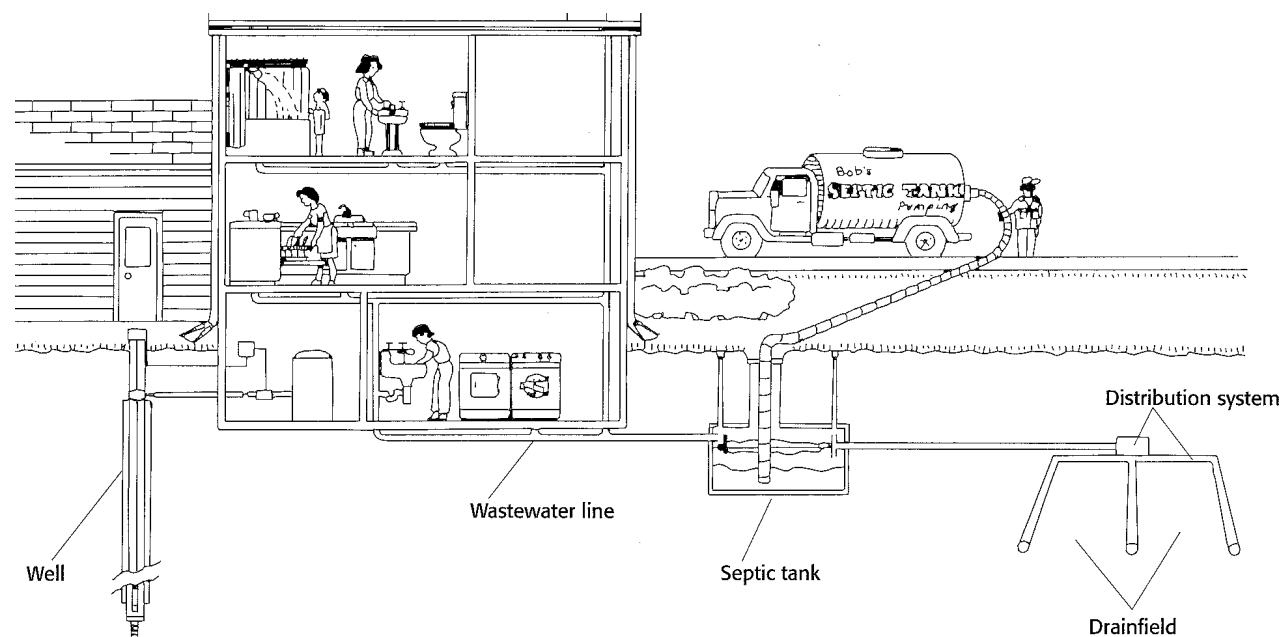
Household wastewater carries dirt, soap, food, grease and bodily wastes out of your house to an on-site septic or municipal wastewater treatment system.
